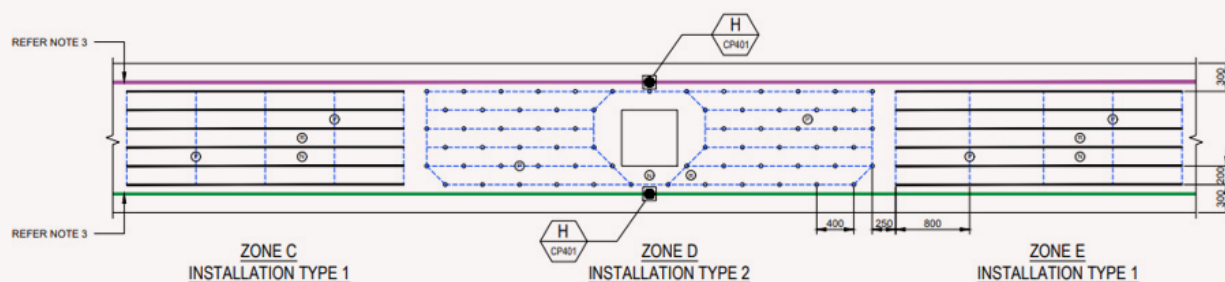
Detailed anode arrangement within a band beam, as viewed from below the beam.
